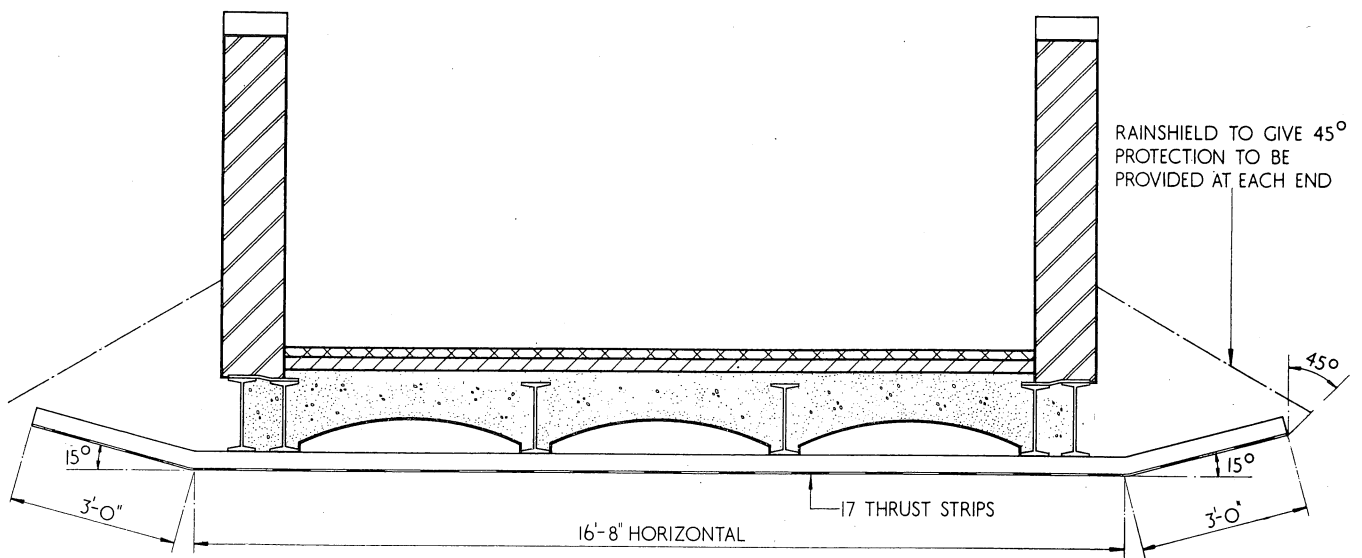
Details of Mark VI butyl insulation at bridge 1039
